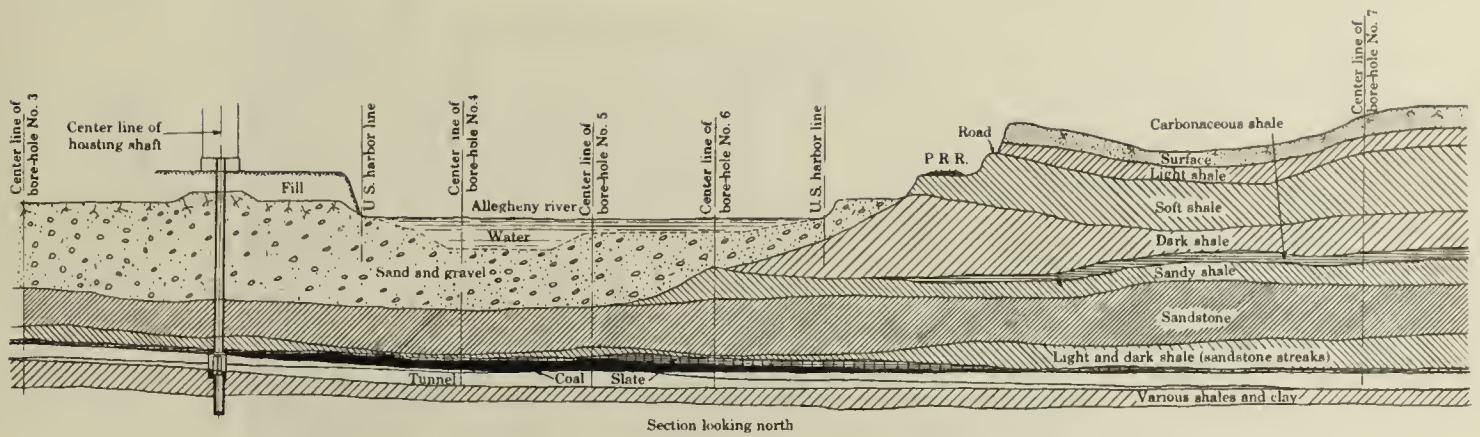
PROFILE SHOWING STRATA ABOVE THE RIVER TUNNELS
